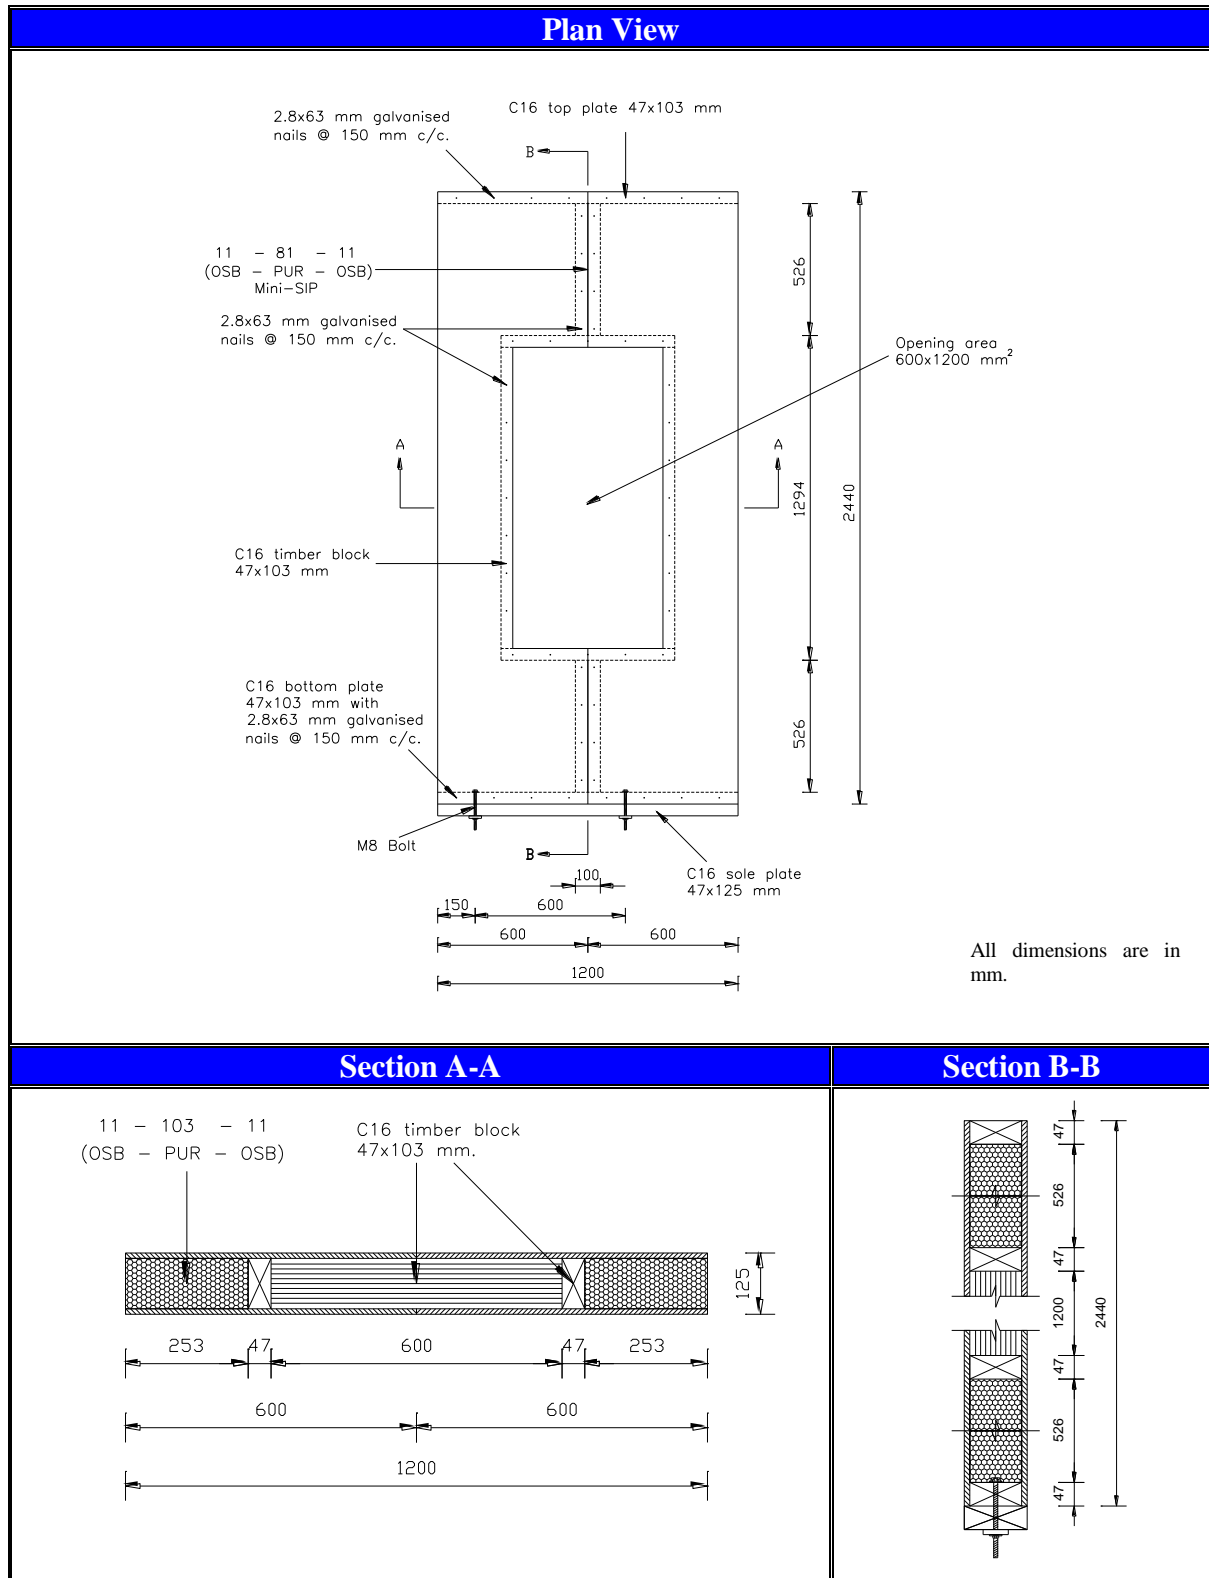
SIP with mini-sip connection and opening (SMCO) details
